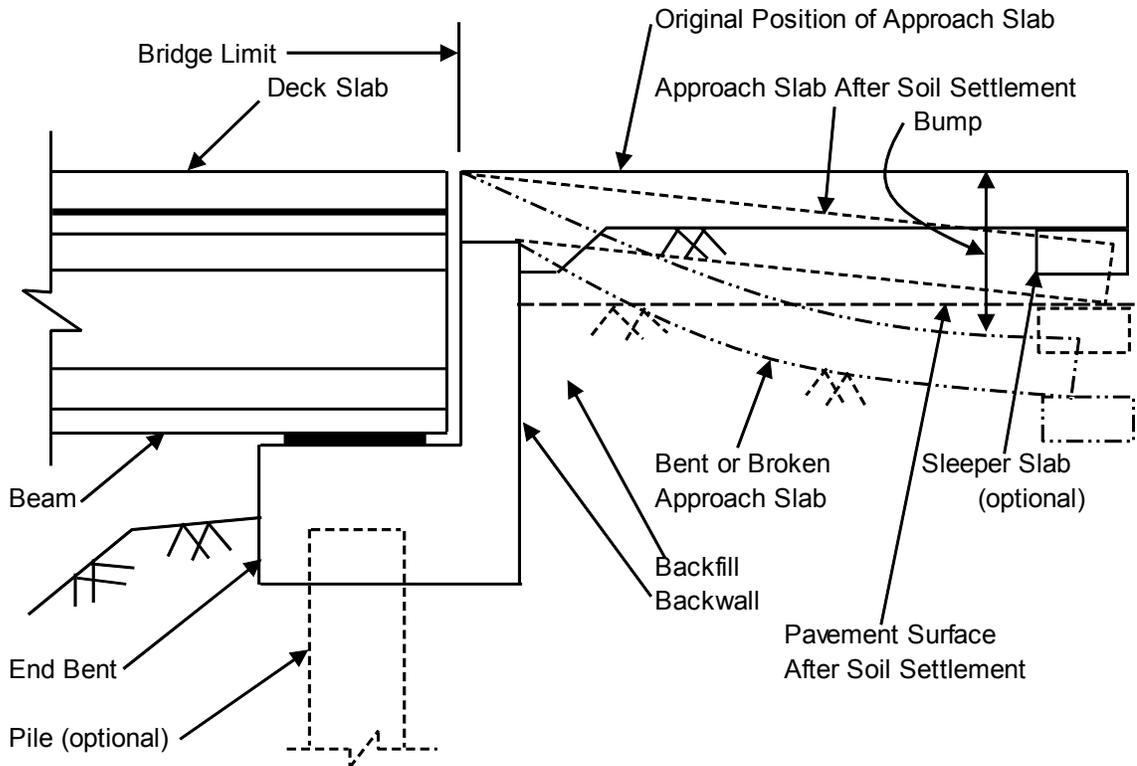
Behavior of Approach Slab due to pavement settlement and bump mechanism
